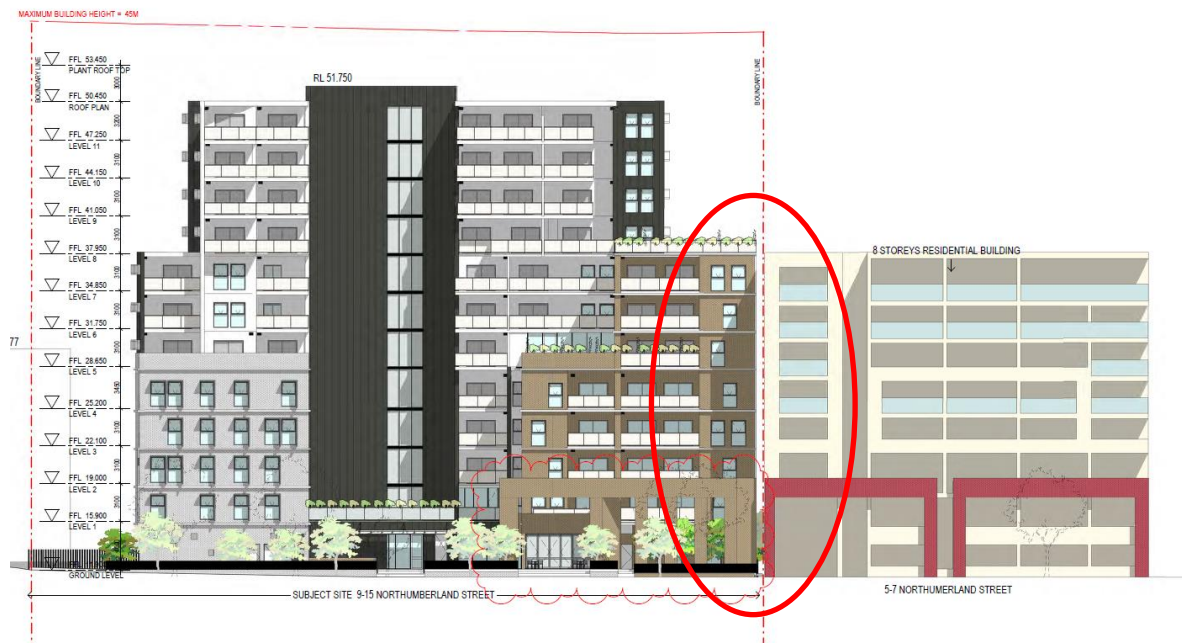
Elevation Plan showing Zero Side Setback to Northern Boundary circled in red
